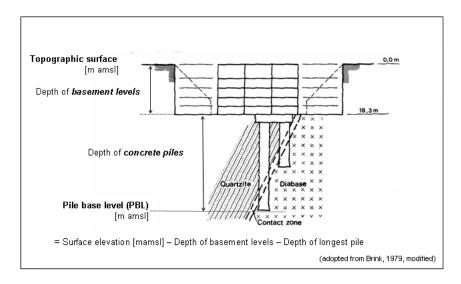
Cross section through the excavation pit for the old Std. Bank centre (cnr. Fox- and Simmonds Street, meanwhile sold by Std. Bank) illustrating how the pile base level (PBL) is calculated
